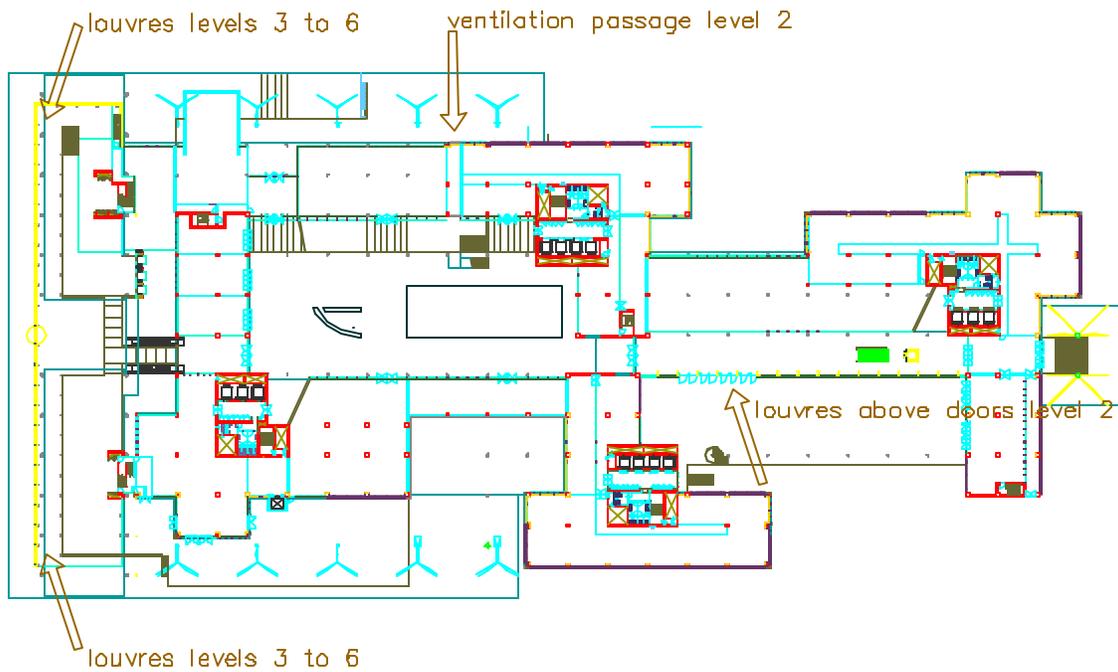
Floor Plan Showing Ventilation Intakes for WTC, not to scale (courtesy of KPFI)
